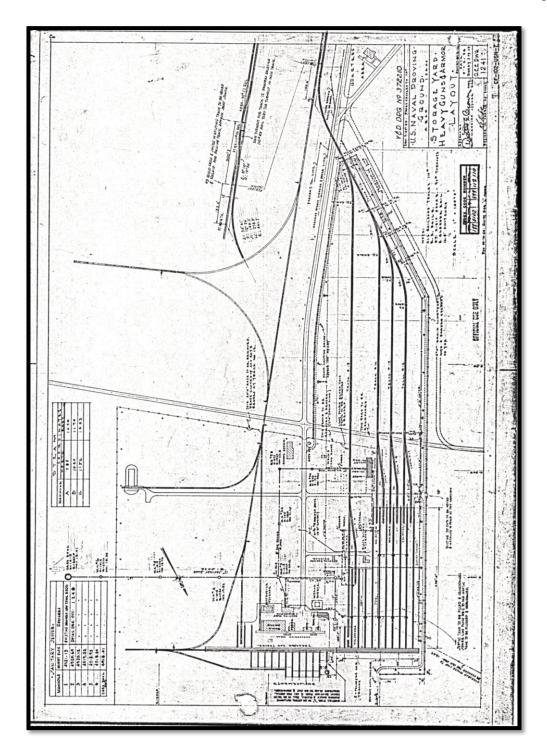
INL drawing number 112110 (CF-102-USN-7); storage yard, heavy guns and armor layout; sheet 1 of 17; July 1944.
